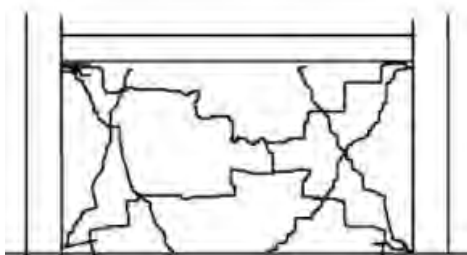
Typical degree of damage for corner crushing (FEMA 306, 1998).
